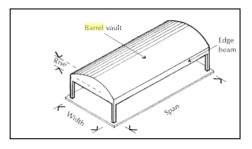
Detail by reinforced concrete long span barrel vaults (Stroud Foster, 1976.pp 232)
